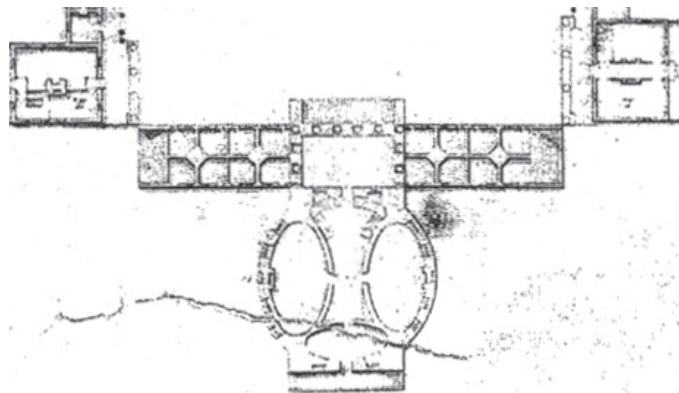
Plan by John Neilson of the Lawn (first floor level), circa November 1821 (detail of Rotunda, below). Note north porch and steps of the Rotunda. [Virginia State Library]
